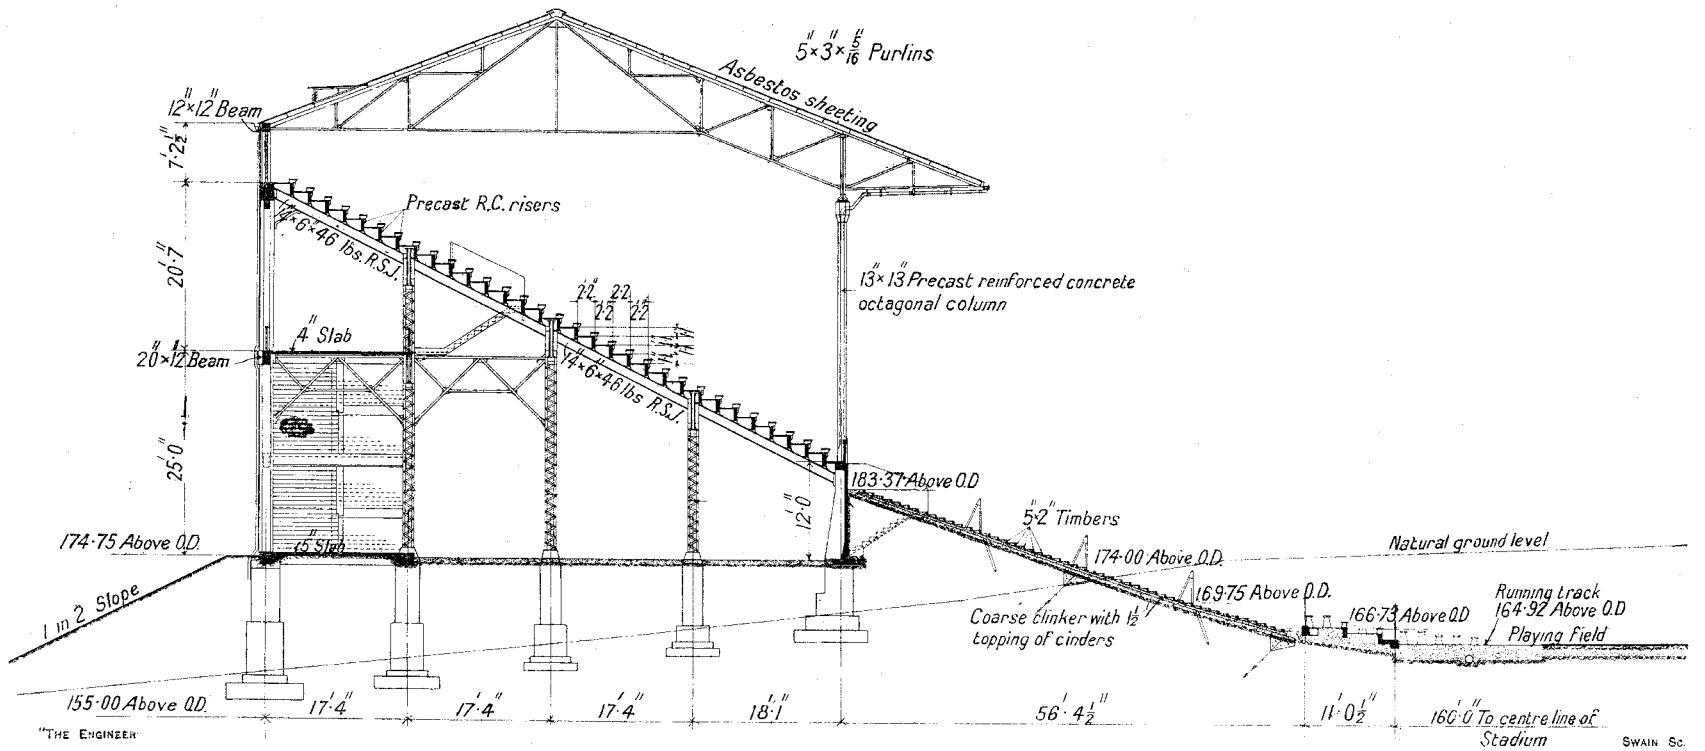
TYPICAL CROSS SECTION THROUGH SOUTH FACE OF THE BUILDING
